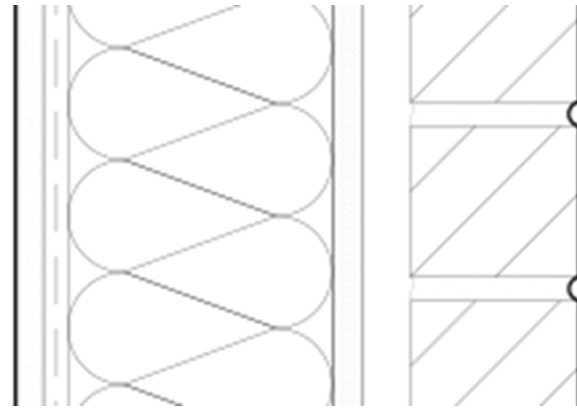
Case 2 with Fibreboard Sheathing (Source: Twiddy, 2011)
